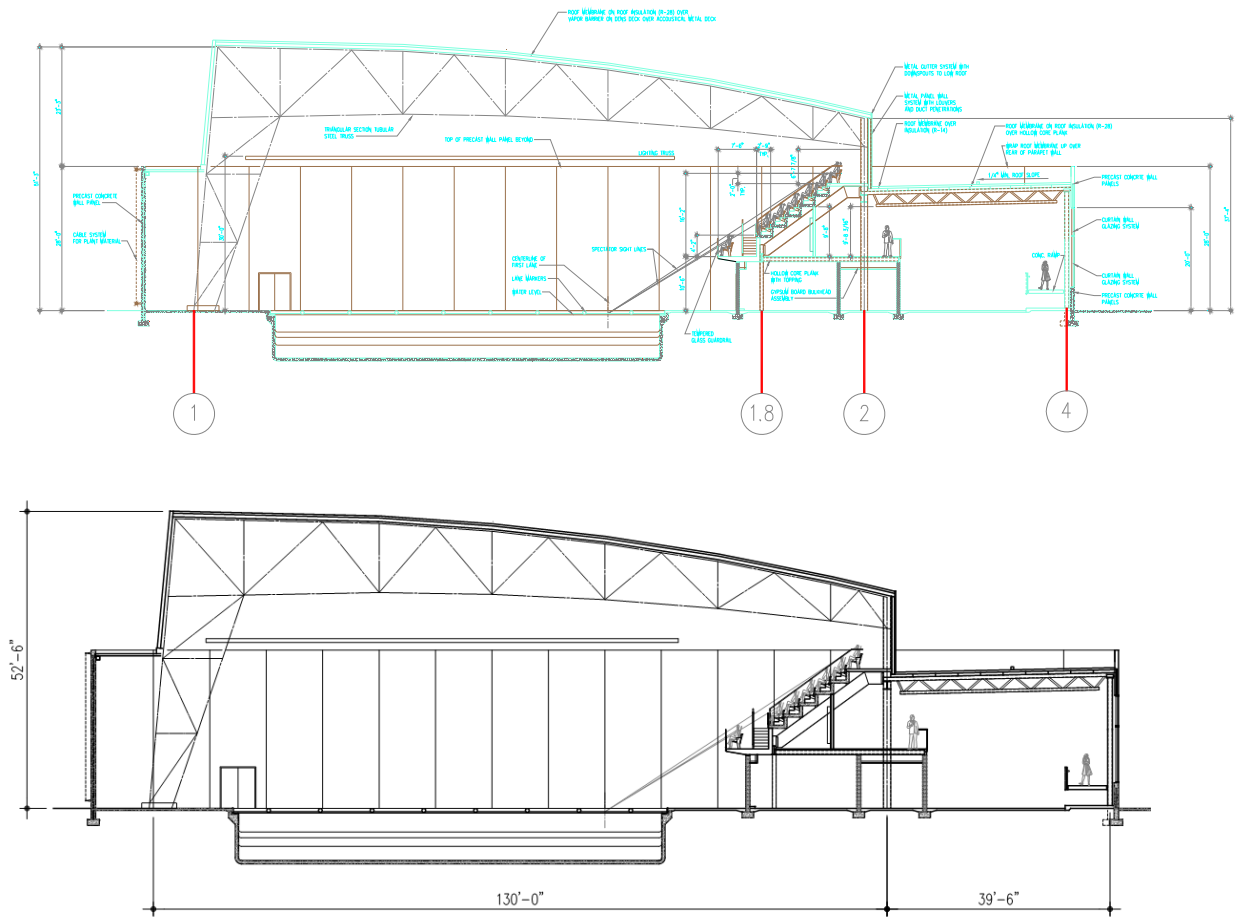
Cross Section Through Center of Building (Looking North); Top Figure Shows Column Lines Mentioned Throughout Thesis Report
